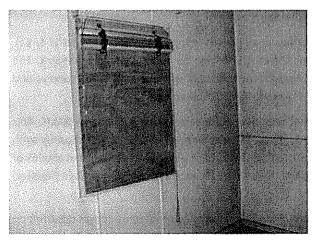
Lining of room 2 (Bedroom 2) opposite the main living room
